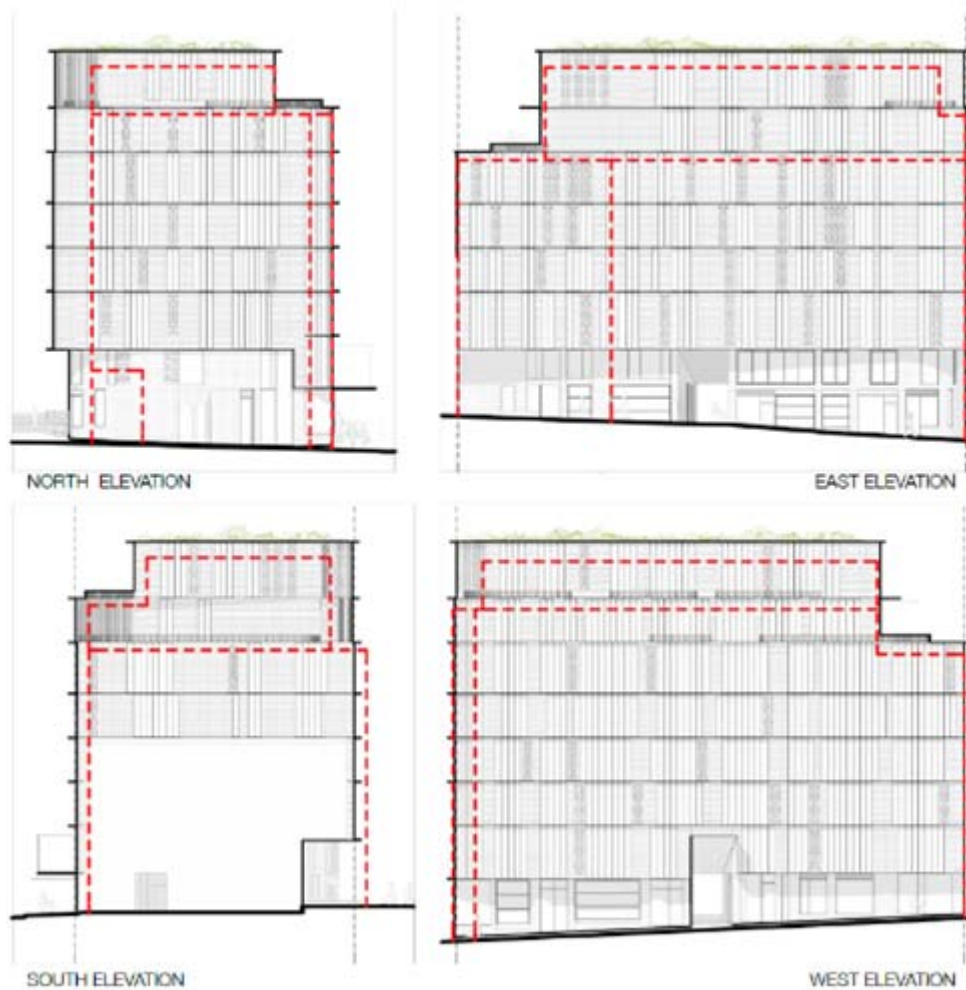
Building A elevation – Stage 1 approved envelope in dotted line.
